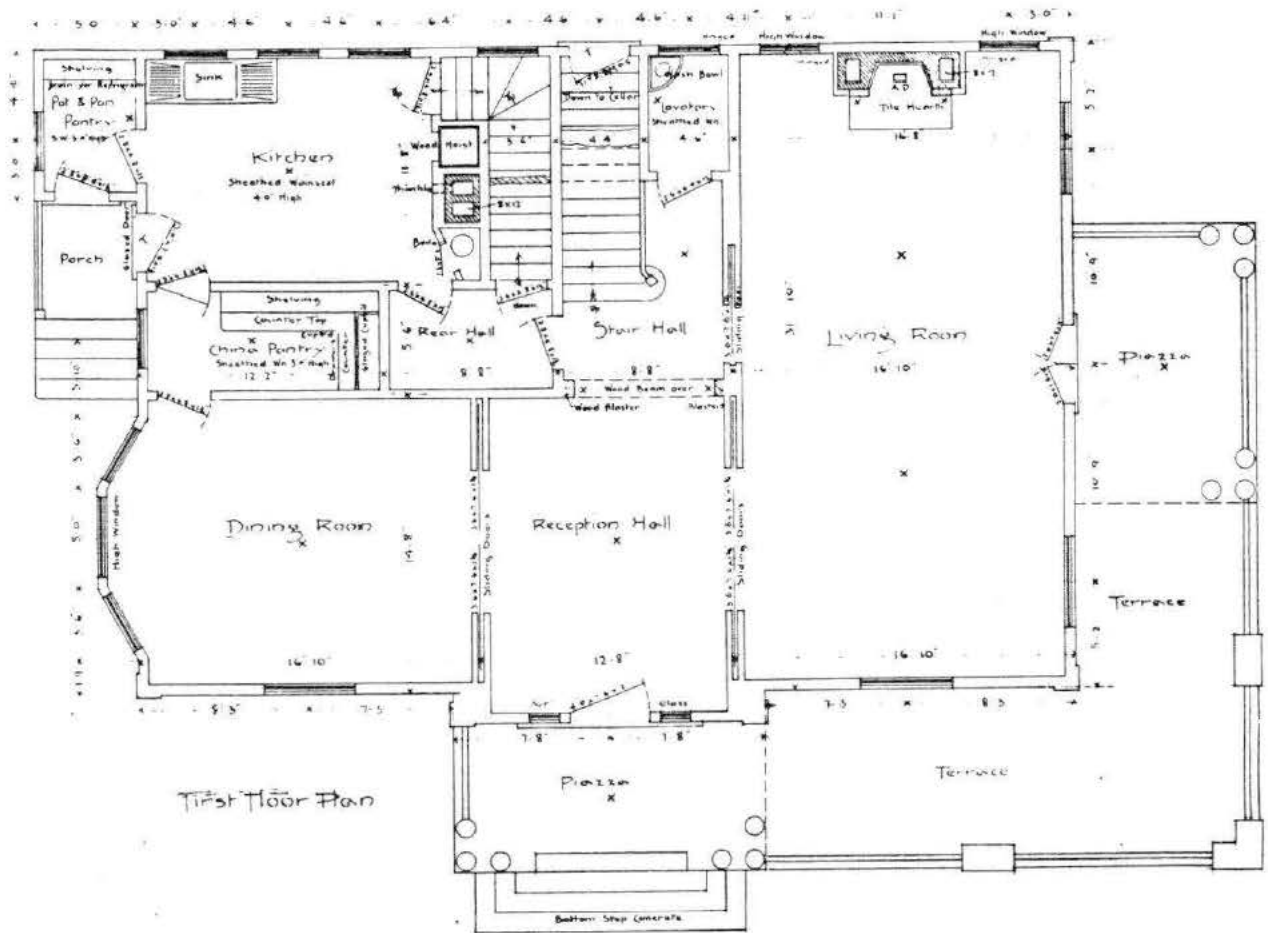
Emil Schacht, Bryan residence, Portland, date unknown, first floor plan, (Cachot Therkelsen Collection, Knight Library, Special Collections, University of Oregon).
